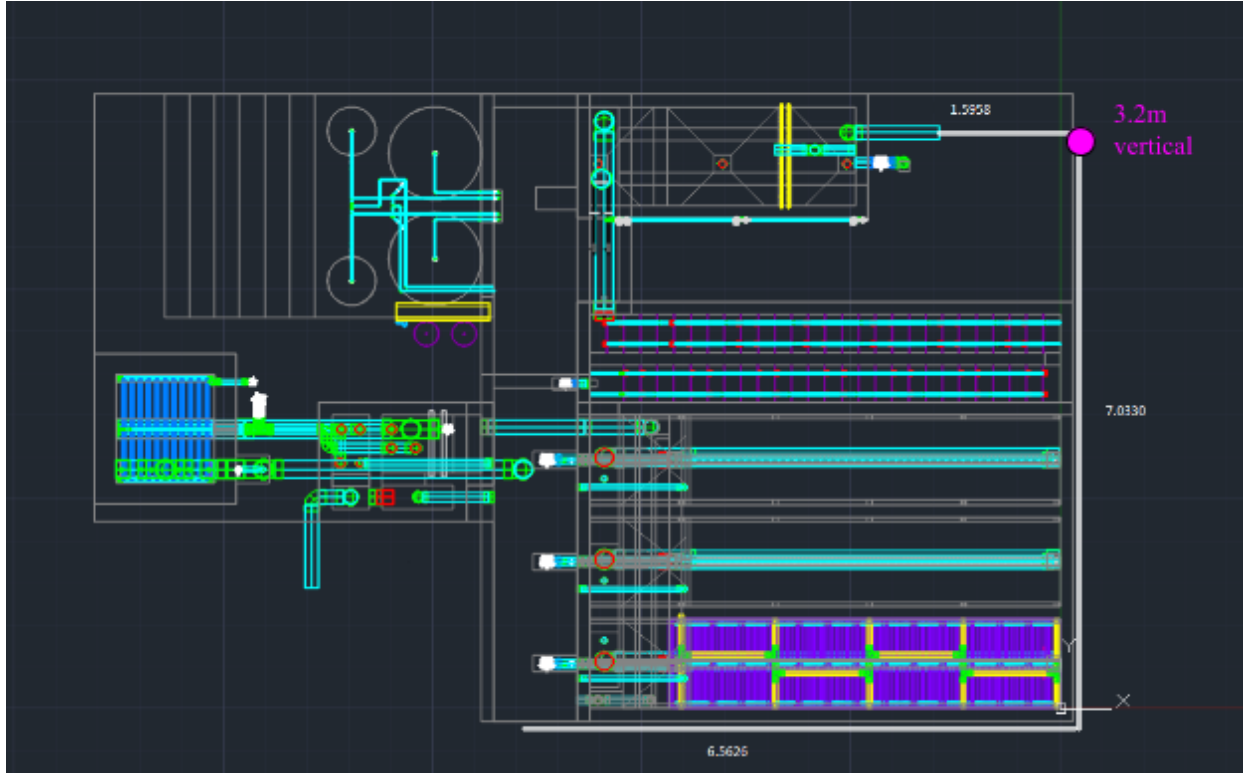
Pipe routing around the plant, lengths in meters. The team decided to build a pipe connecting the settling tank and entrance tank that routes around the plant, since the plant has already been constructed.
